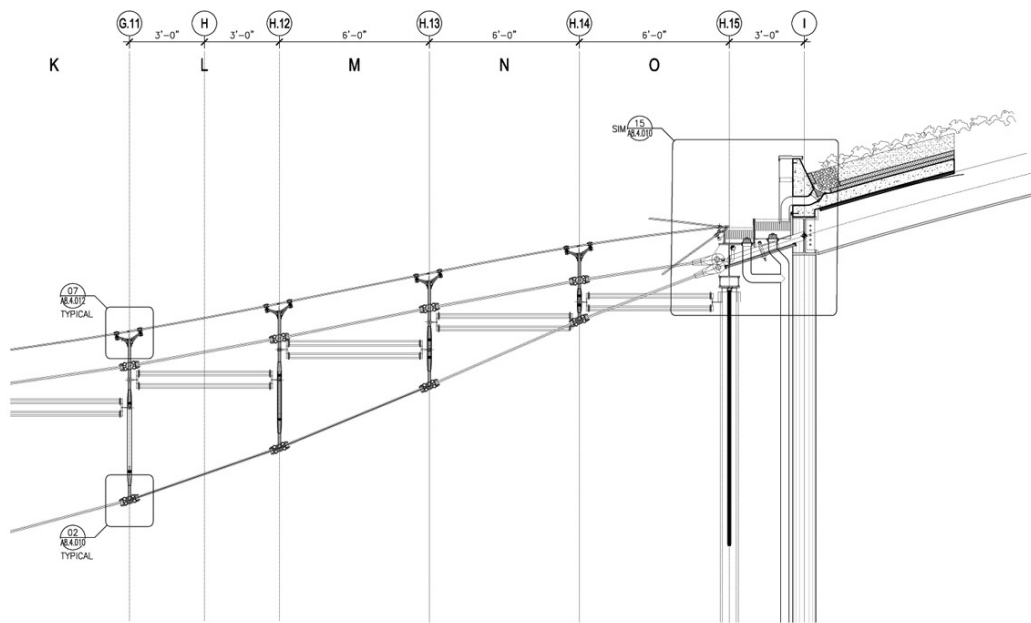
Skylight Truss Detail Section, California Academy of Sciences (by courtesy of Renzo Piano Building Workshop)
